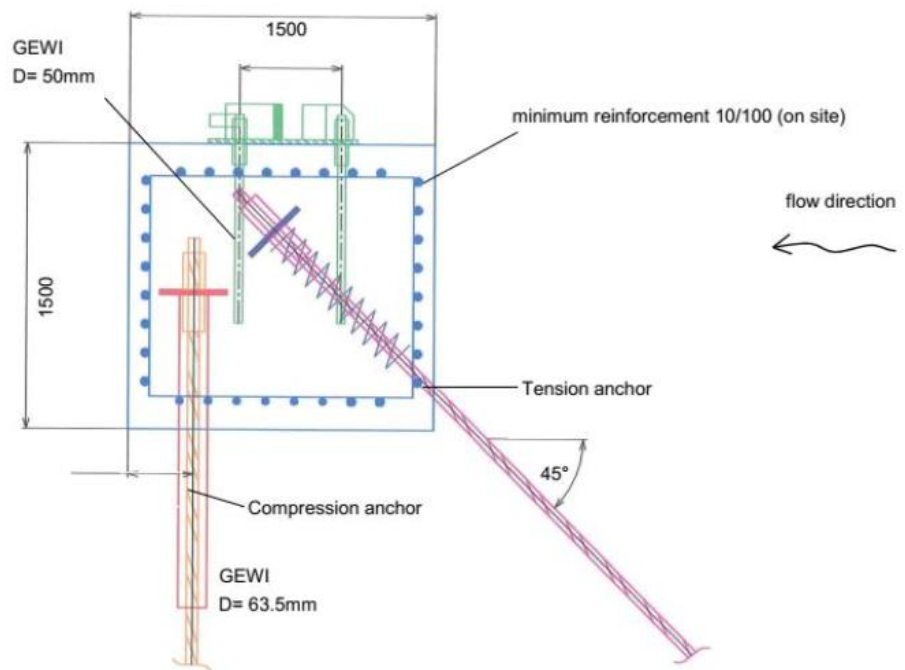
Principal of foundation with pressure anchor and tension rod, sectional view.
